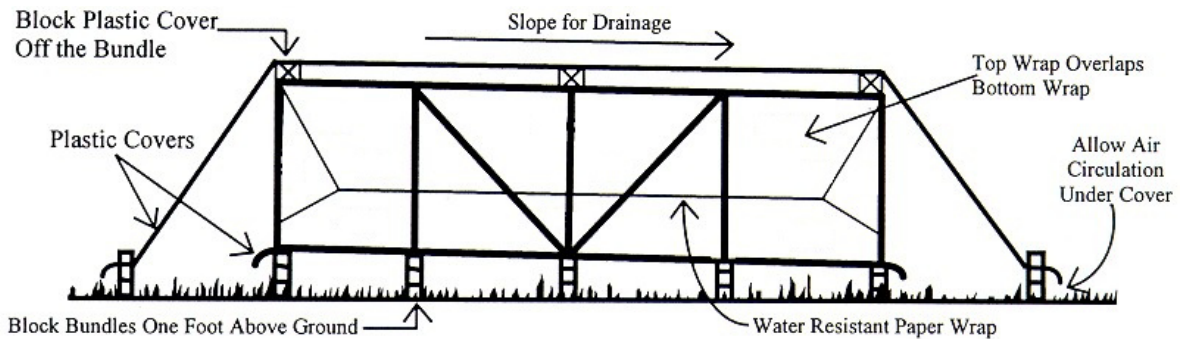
Proper Storage of Building Panel Bundles at Job Site
